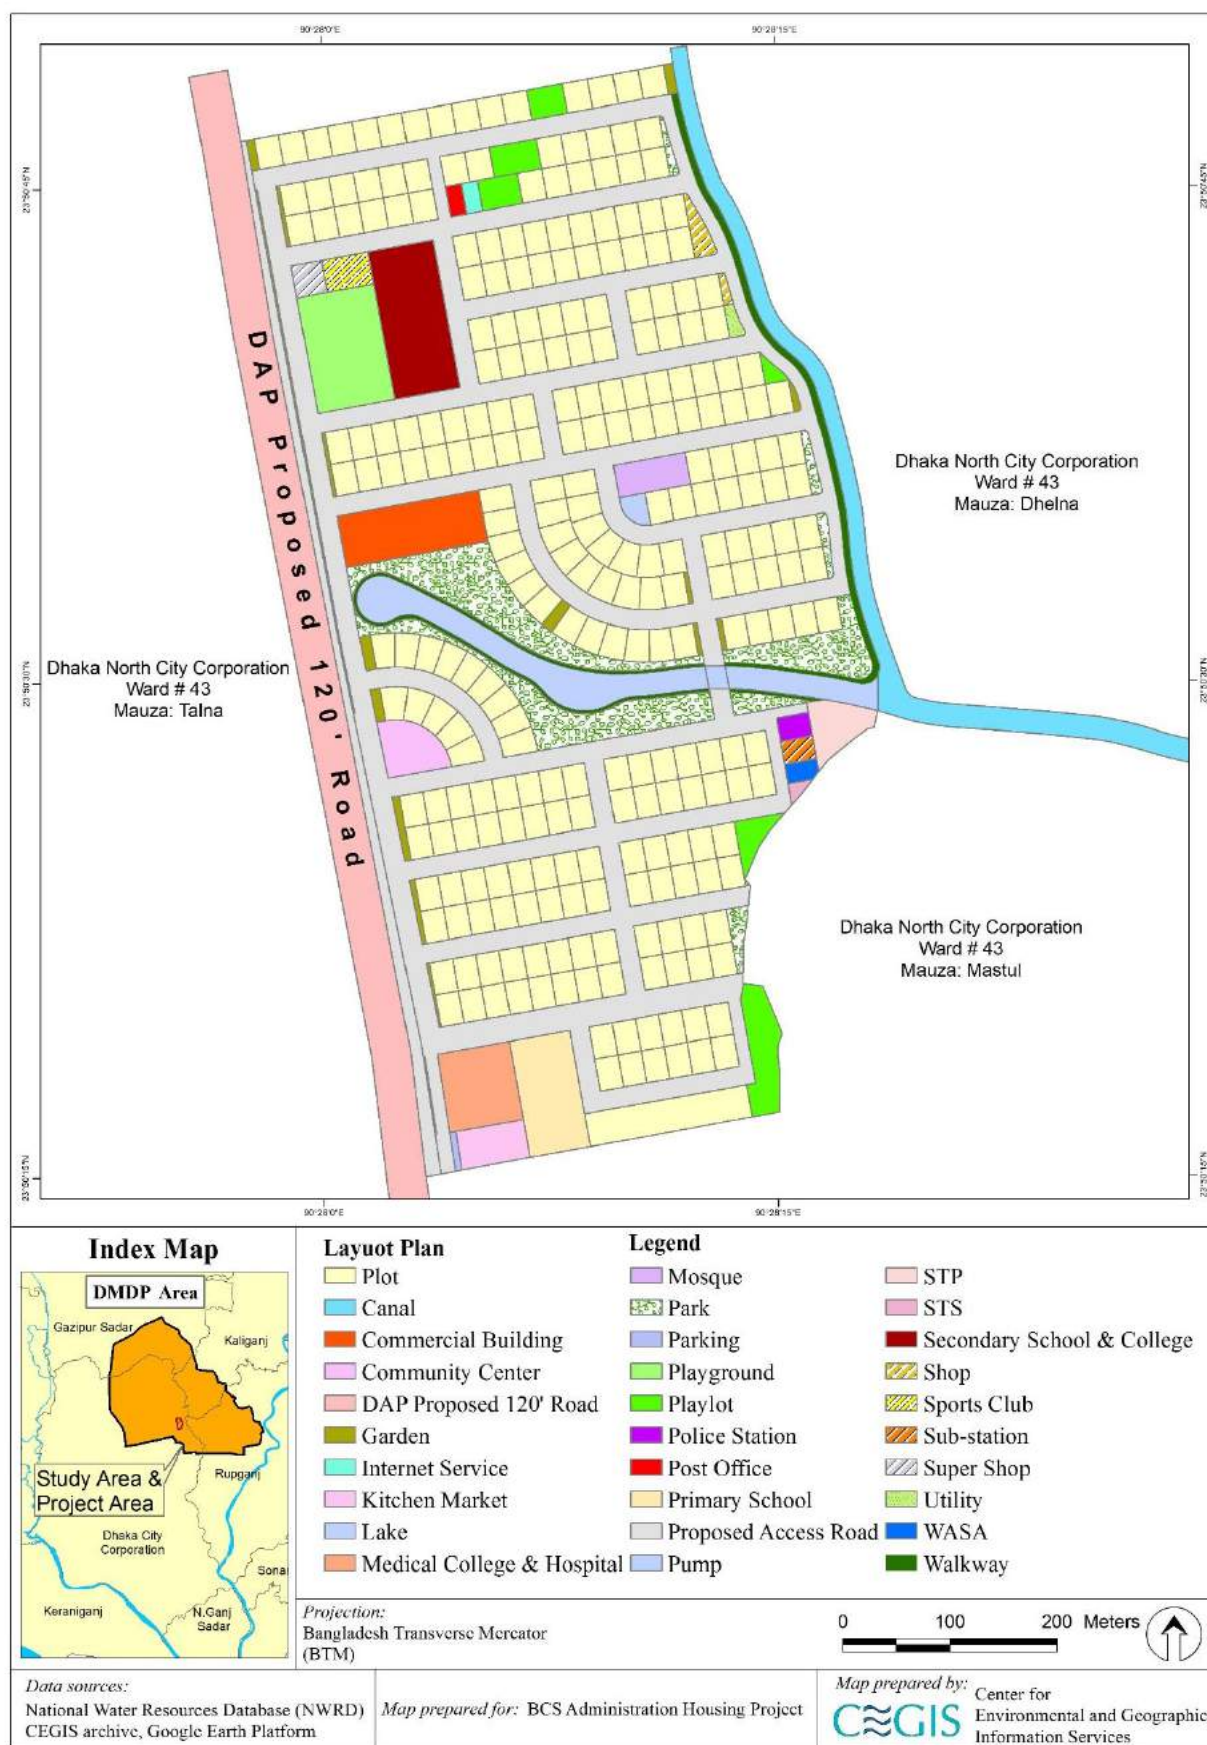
Layout Plan of Khilkhet Abason Prokolpo
